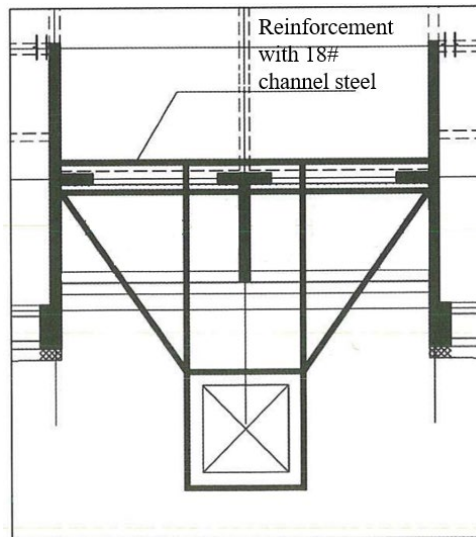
Schematic Diagram of Steel Section Rigid Connection Reinforcement Technique
